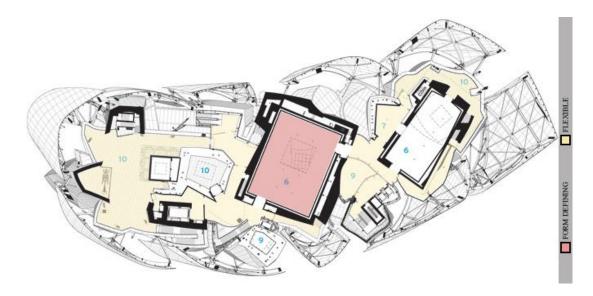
Plan drawing of Fondation Louis Vuitton
